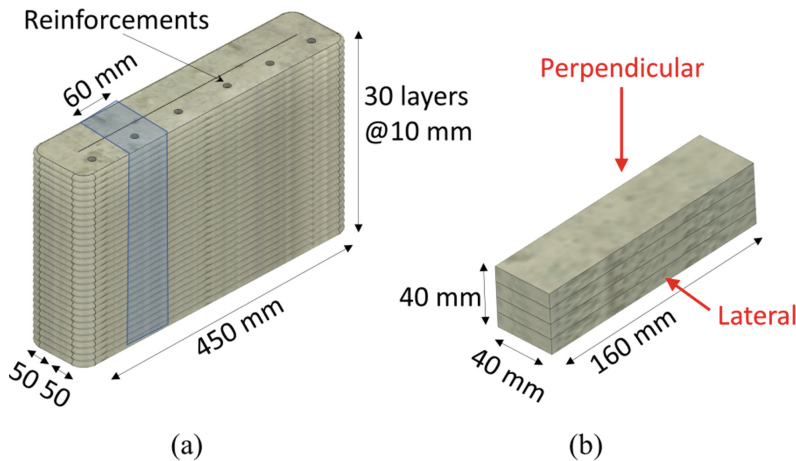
a) Schematic of the printed wall with reinforcement penetrated, with the highlighted area showing the beam section that are cut from it; b) Schematic of the small, 4-layer beam printed for flexural and compression testing with the testing directions shown.
